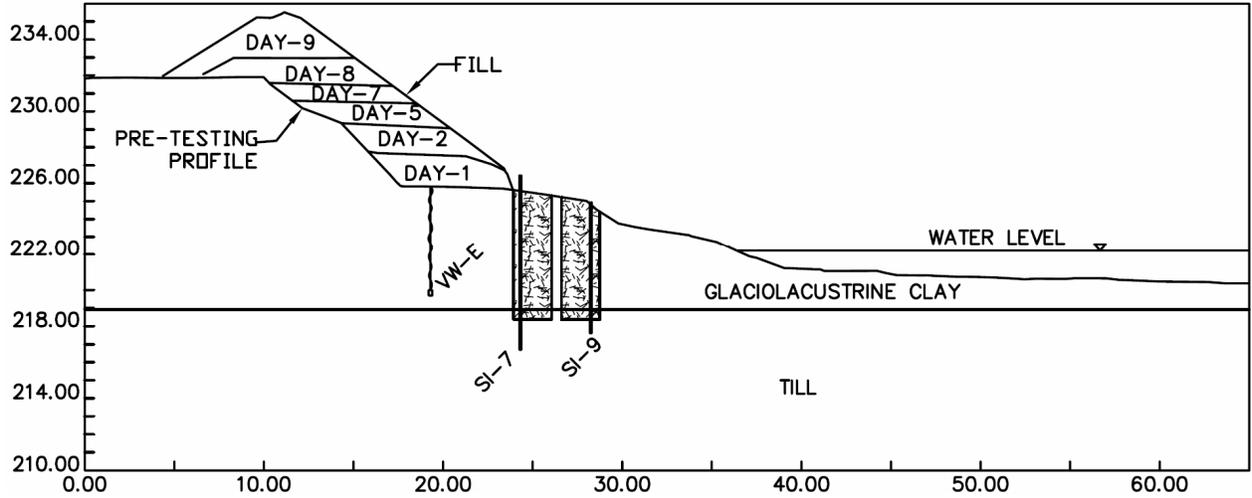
Cross section through centerline of rockfill column test site showing fill staging and select instrumentation
